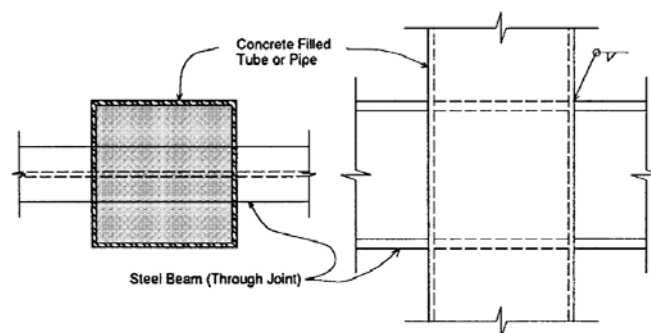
Composite (encased) column-to-steel beam moment connection.
